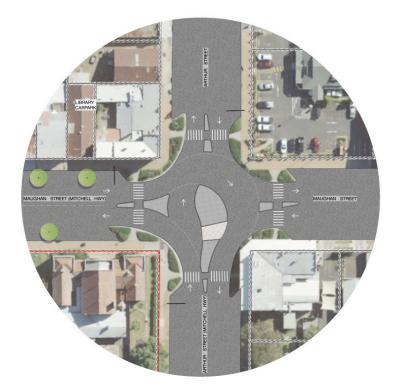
Concept: Maughan and Arthur Streets – pedestrianised intersection
